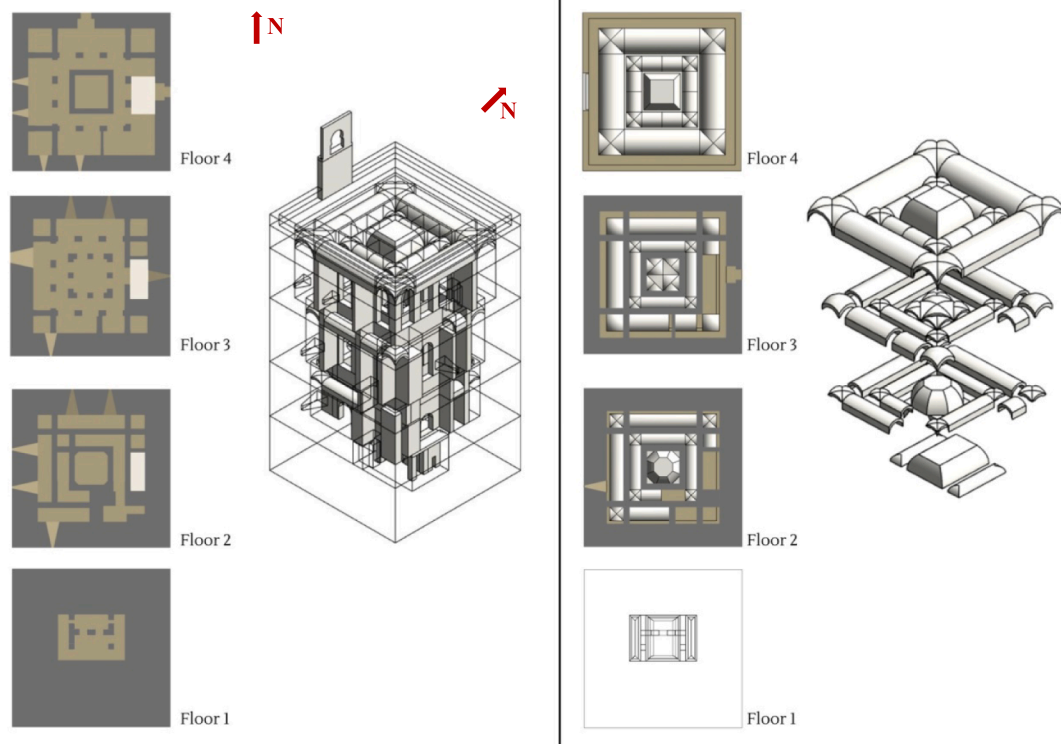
(left) Reconstruction of plans and 3D model; (right) vaults layout; according to existing drawings and literature.
